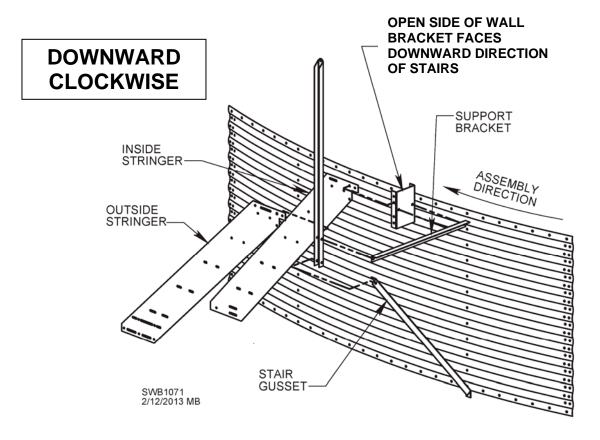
Positioning stringers and brackets when installing stairs downward clockwise
